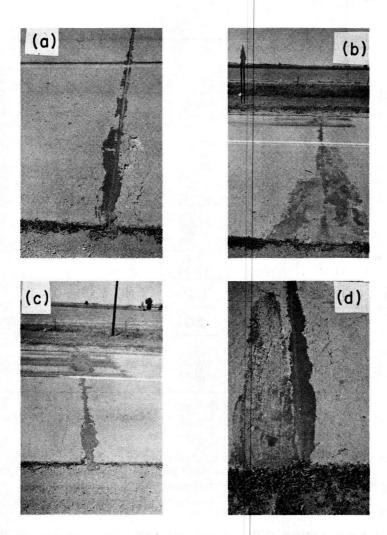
Typical deterioration at transverse joints, as follows: (a) joint disintegration, 30-ft panels, doweled joints, Div. 1, Sta. 212 + 40; (b) joint spalled and patched, 30-ft panels, doweled joints, Div. 1, Sta. 214 + 20; (c) joint disintegration, 30-ft panels, doweled joints, Div. 1, Sta. 217 + 20; and (d) joint disintegration, 20ft panels, doweled joints, Div. 1, Sta. 248 + 90.
